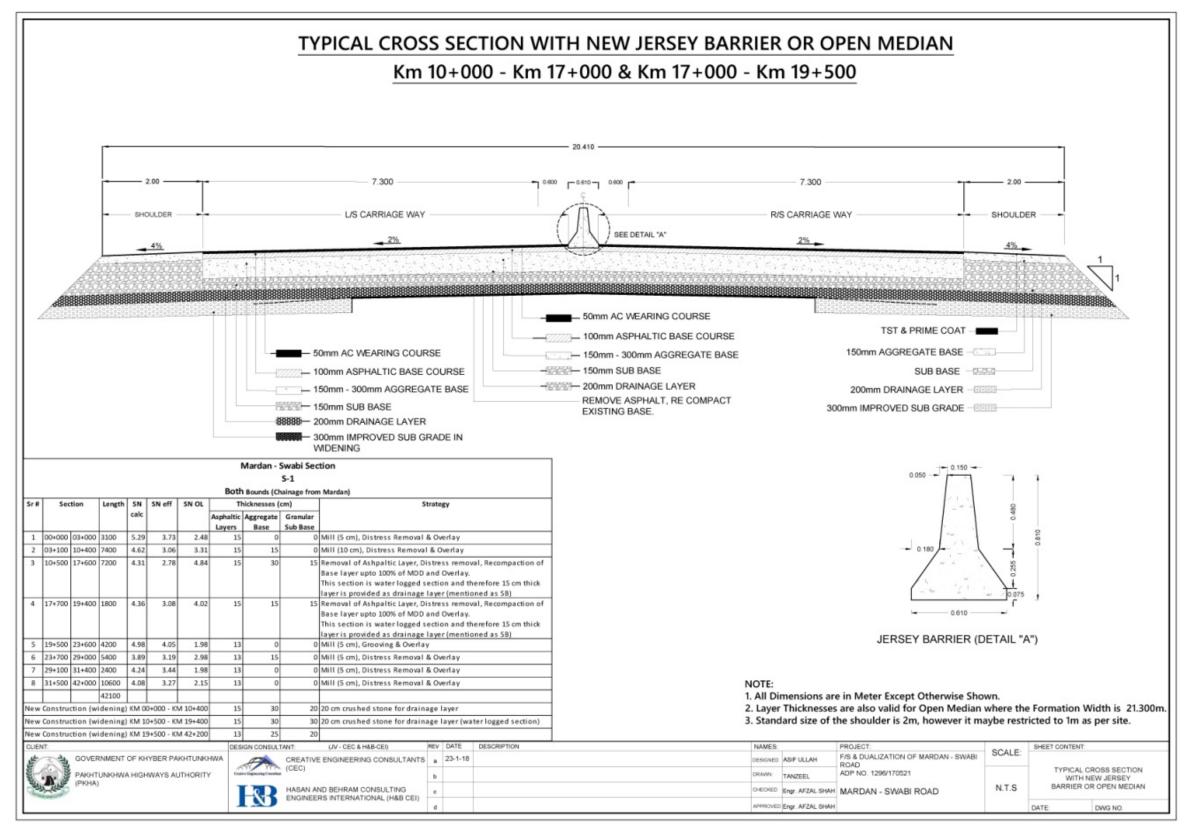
Typical Cross Section with New Jersey Barrier (km 10+00-km 19+500)
